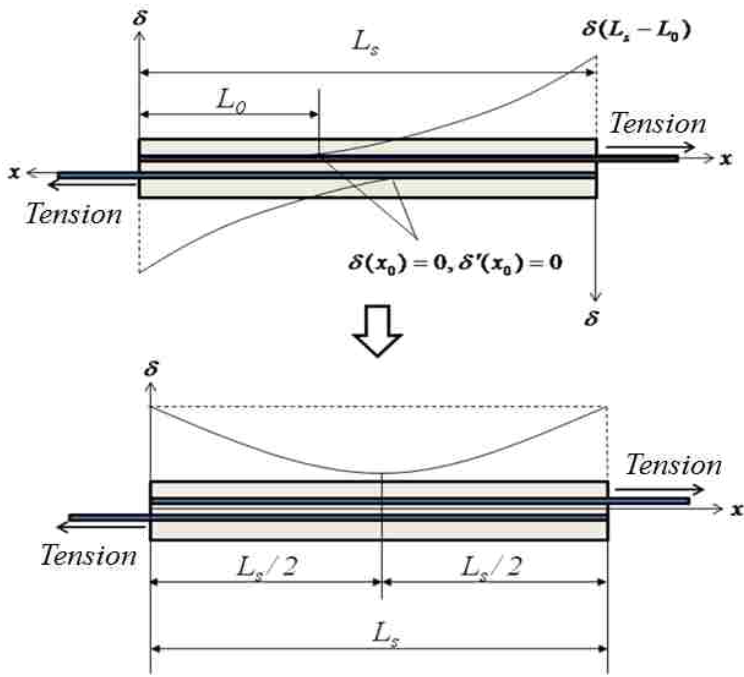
Slip Distribution of Rebar in Splice with Uncracked Concrete
